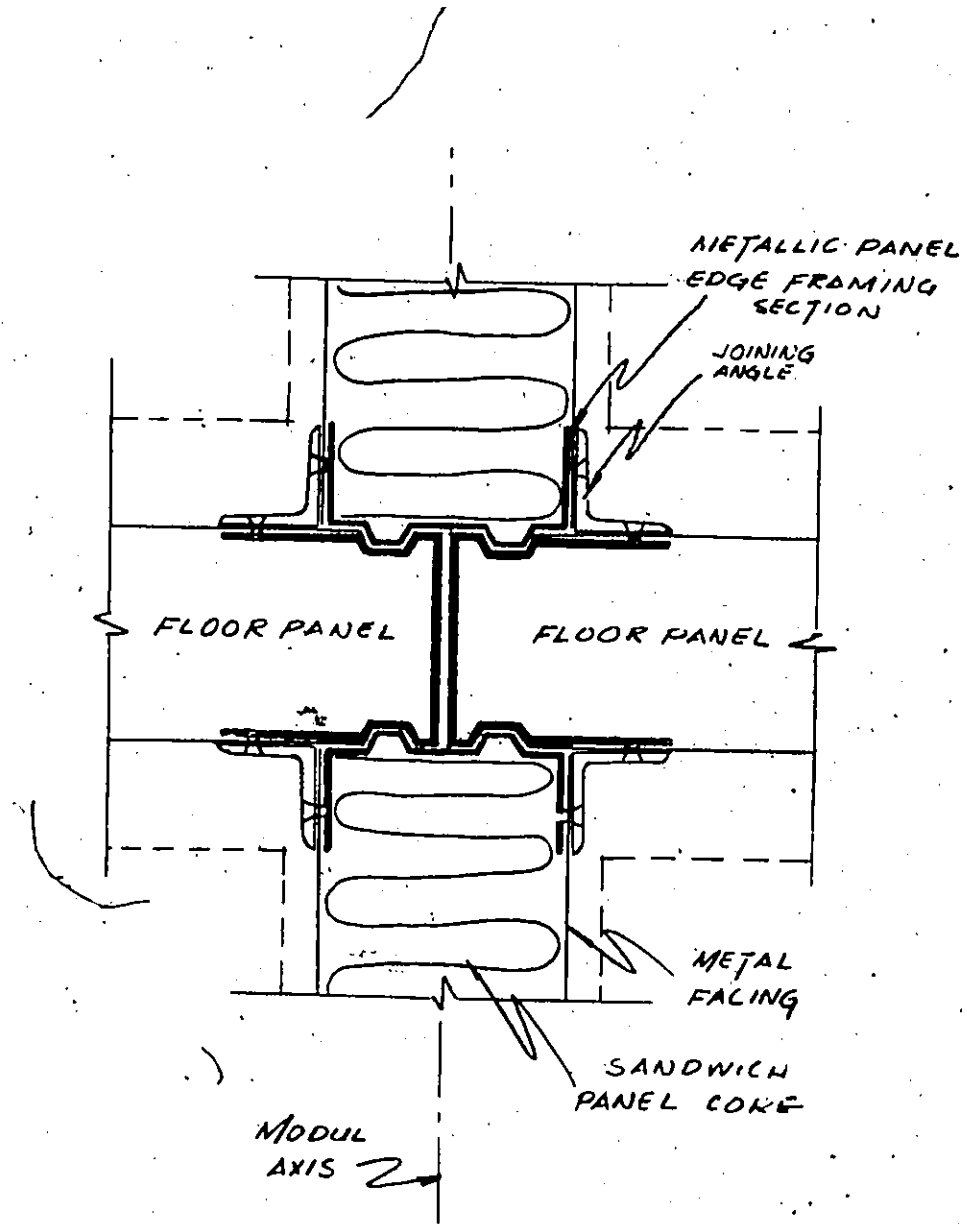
HORIZONTAL JOINT, INTERNAL WALL PANELS
